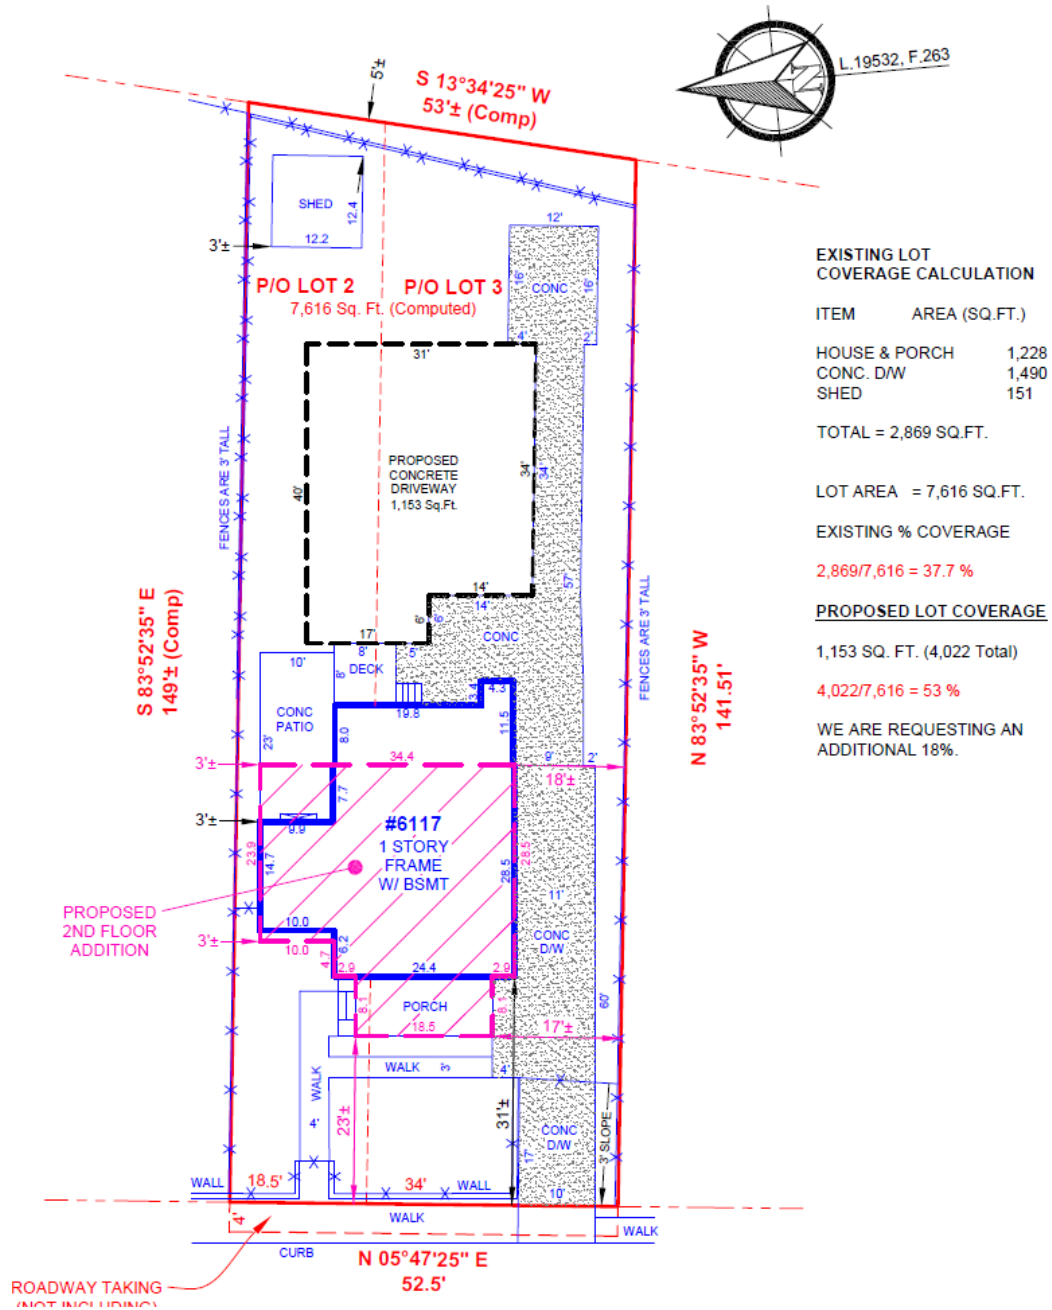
Proposed addition at 6117 42nd Avenue, Hyattsville
